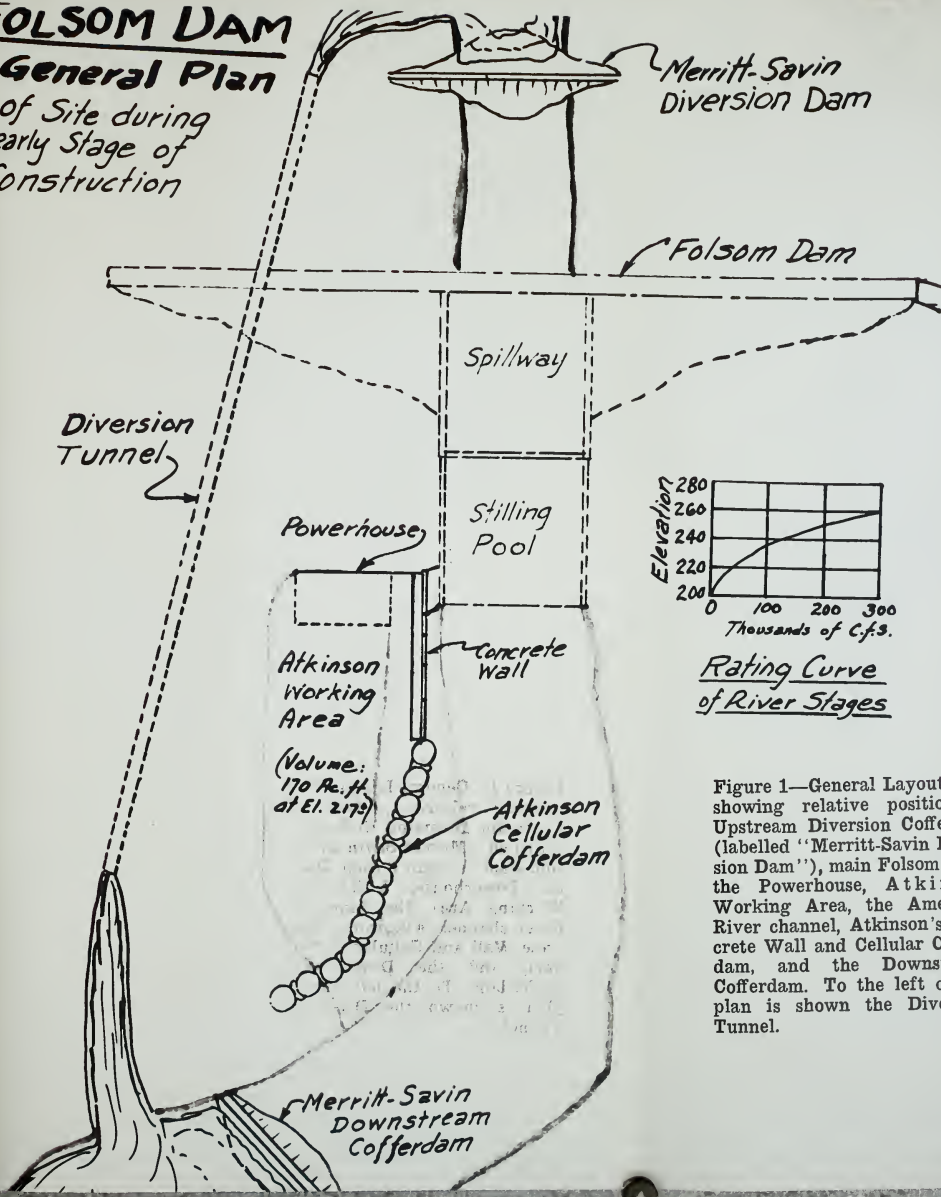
General Layout Plan showing relative position of Upstream Diversion Cofferdam (labelled "Merritt-Savin Diversion Dam"), main Folsom Dam, the Powerhouse, Atkinson Working Area, the American River channel, Atkinson's Concrete Wall and Cellular Cofferdam, and the Downstream Cofferdam. To the left of the plan is shown the Diversion Tunnel.
